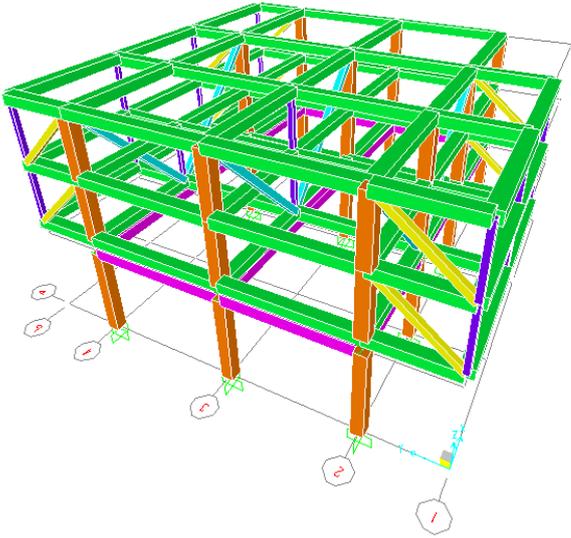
A 3D View of the Structural Model with tie-Beams (purple colour elements) in SAP2000.
